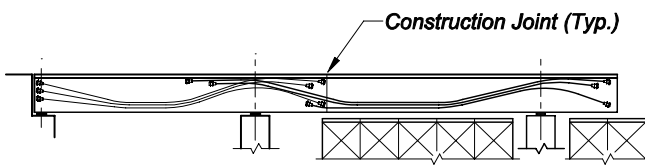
Cast-in-Place on Falsework and Tendon Layout
